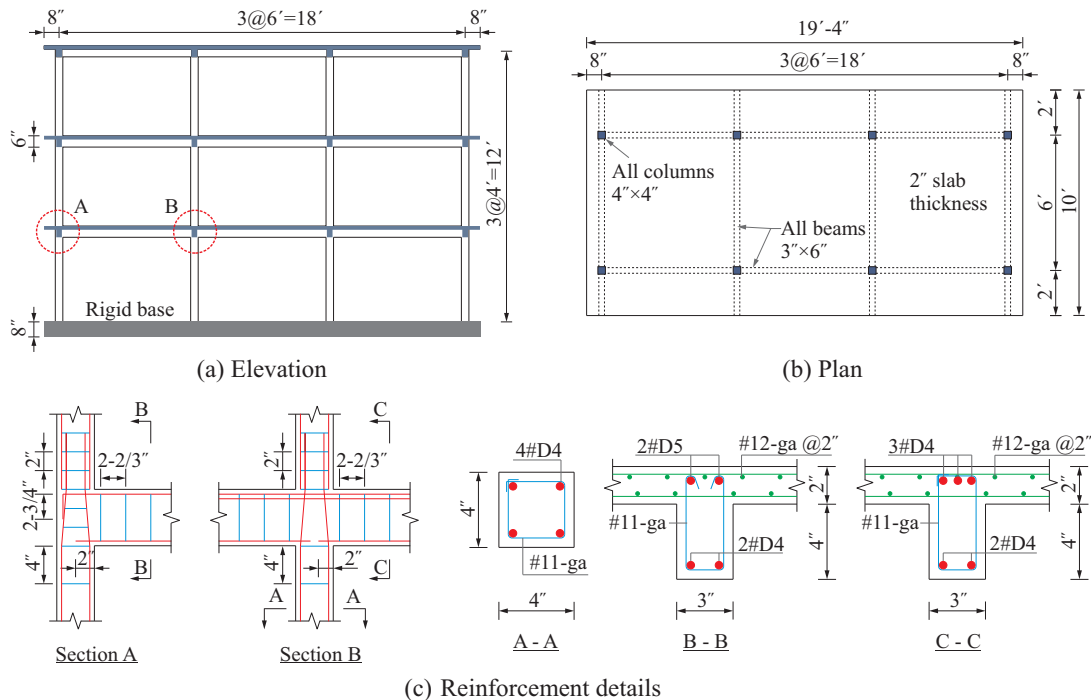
Geometry and reinforcement details of the structure (Bracci et al. 1992)
